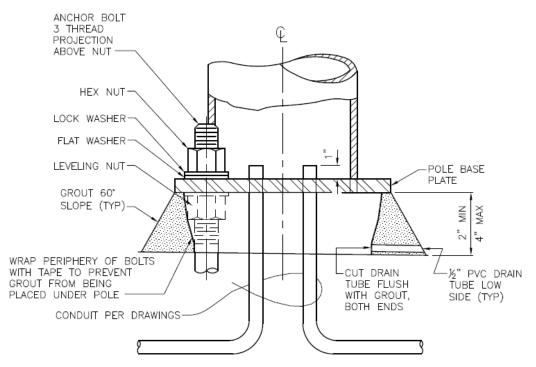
Requirements for Pole Mounting, Grouting and Drain Holes
